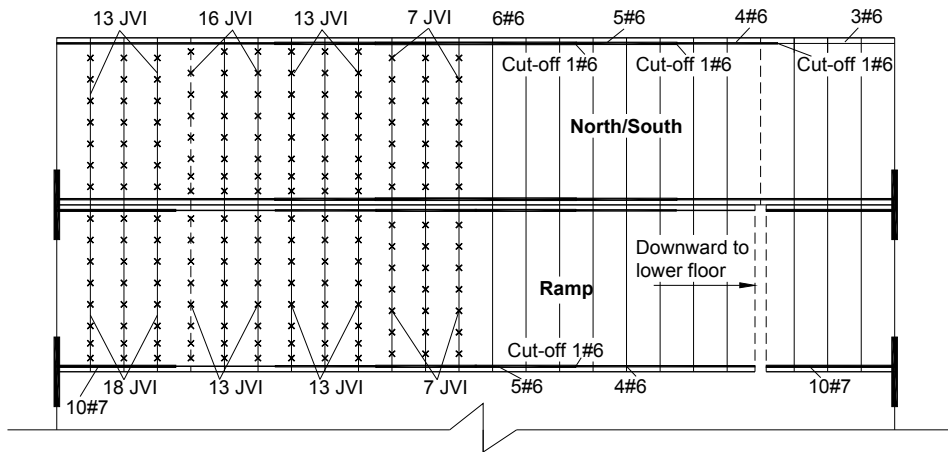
Diaphragm reinforcement at other floors for example 1C.
